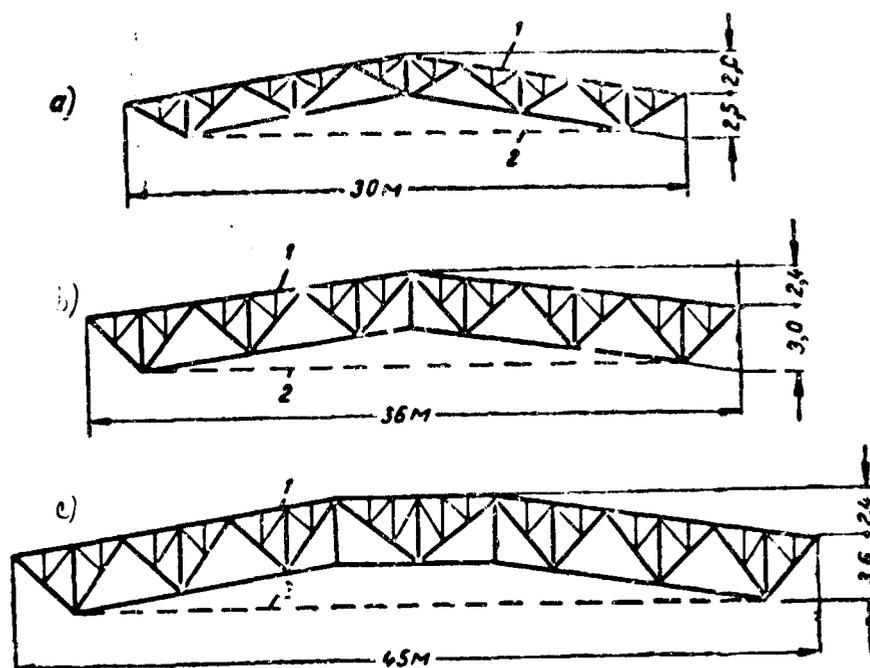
Diagrams of prestressed roof trusses from aluminum alloys
